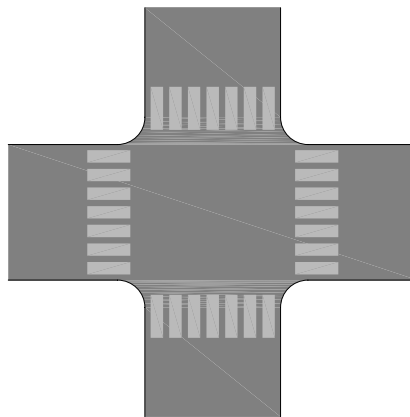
TYPICAL CROSSWALK MARKINGS
